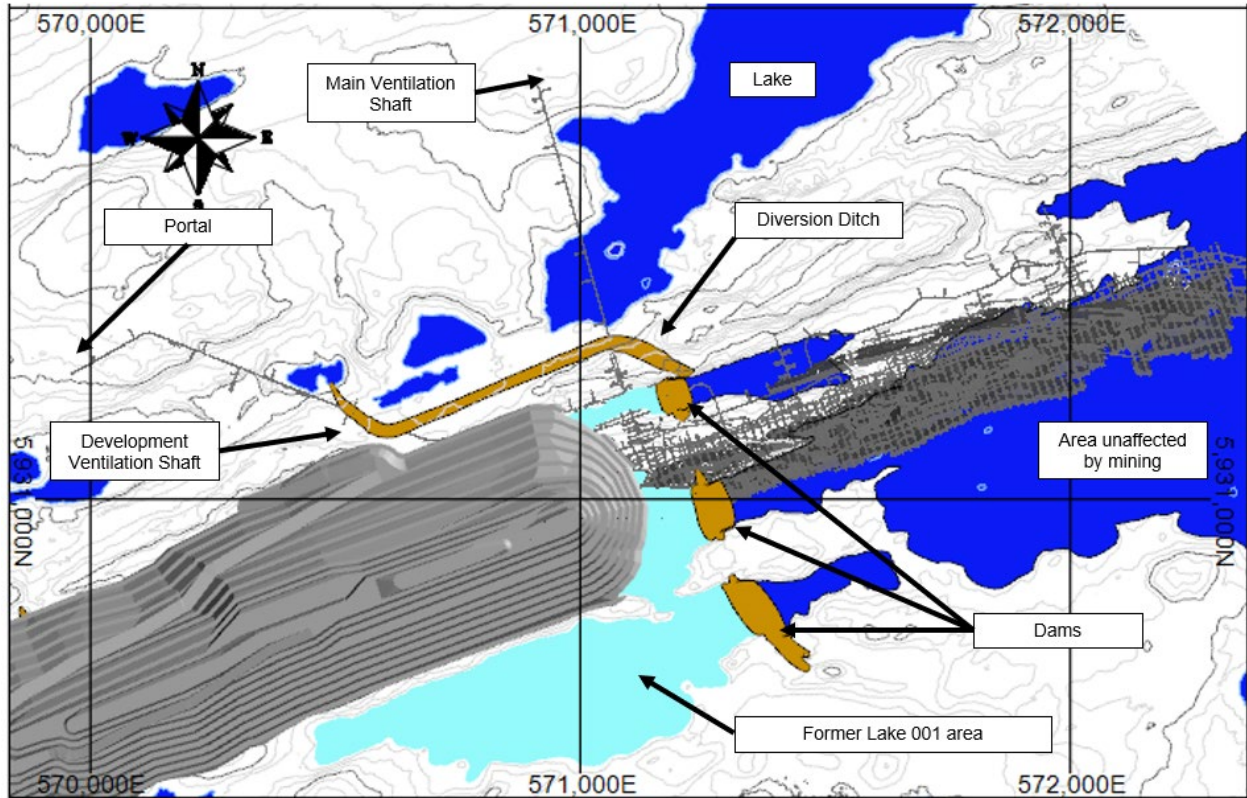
Underground Mine and Surfaces Constraints – Plan View
